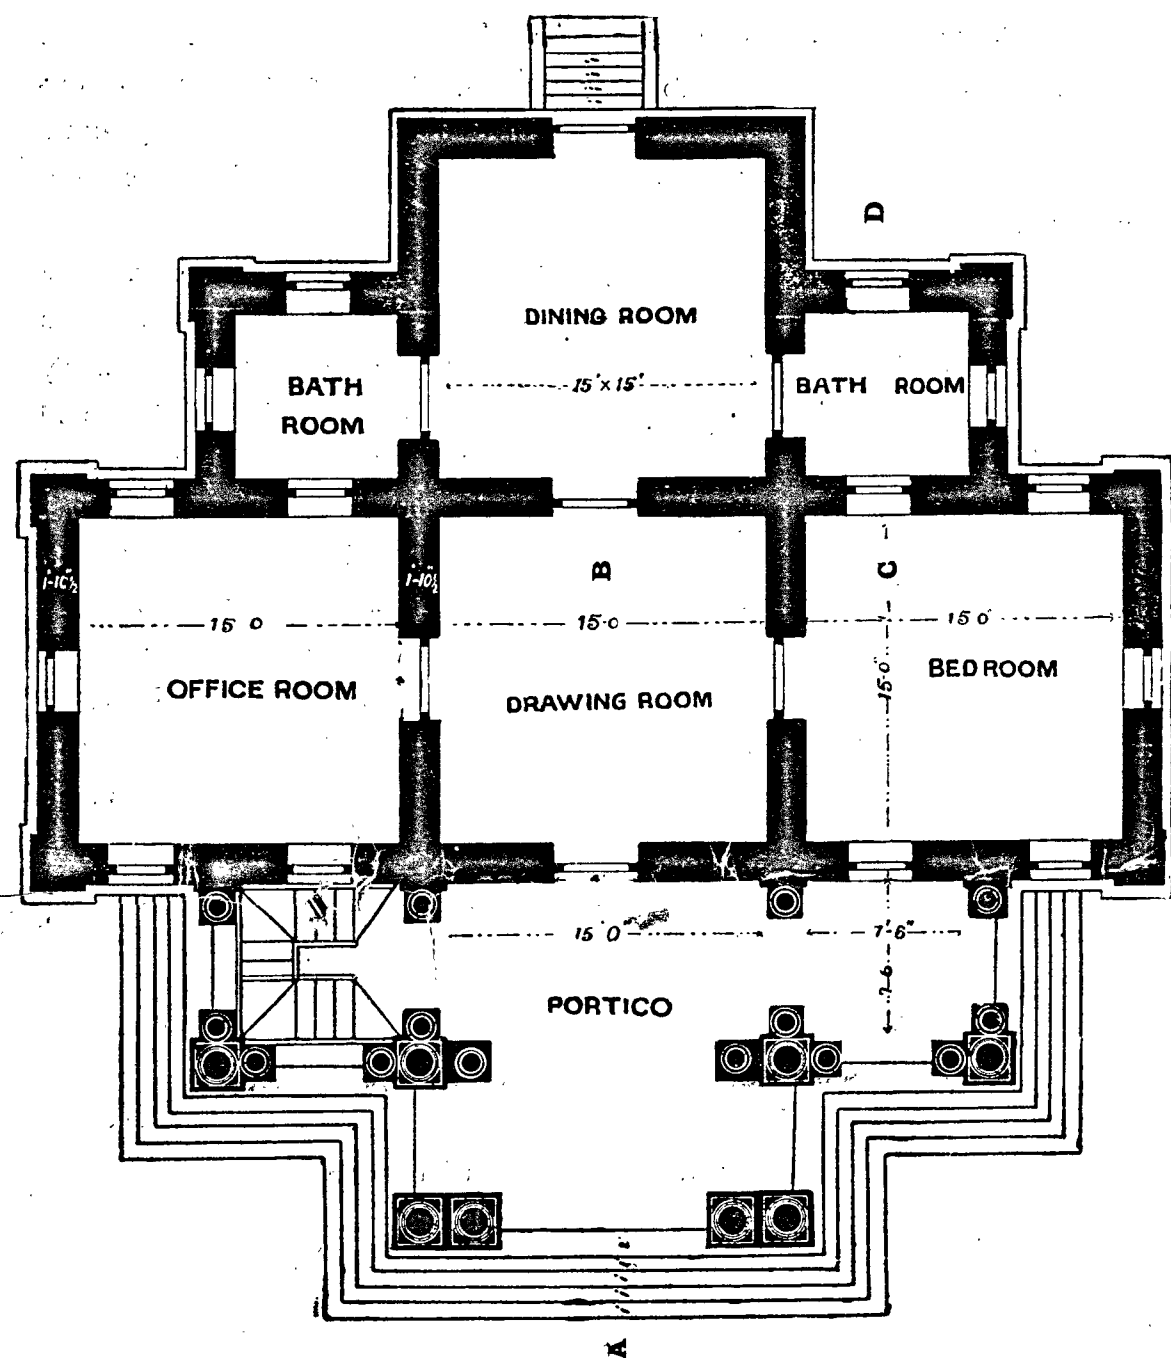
Plate VI-a—showing the plan at ground floor of a building of a Bungalow type.
